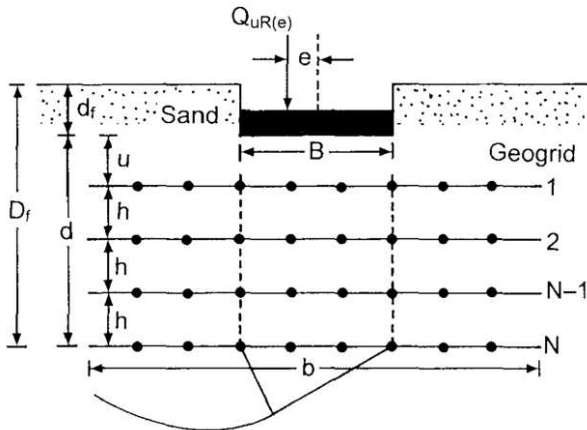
Assumed failure mode under an eccentrically loaded strip foundation on geogrid-reinforced sand (Zhusupbekov et al. 2009)
